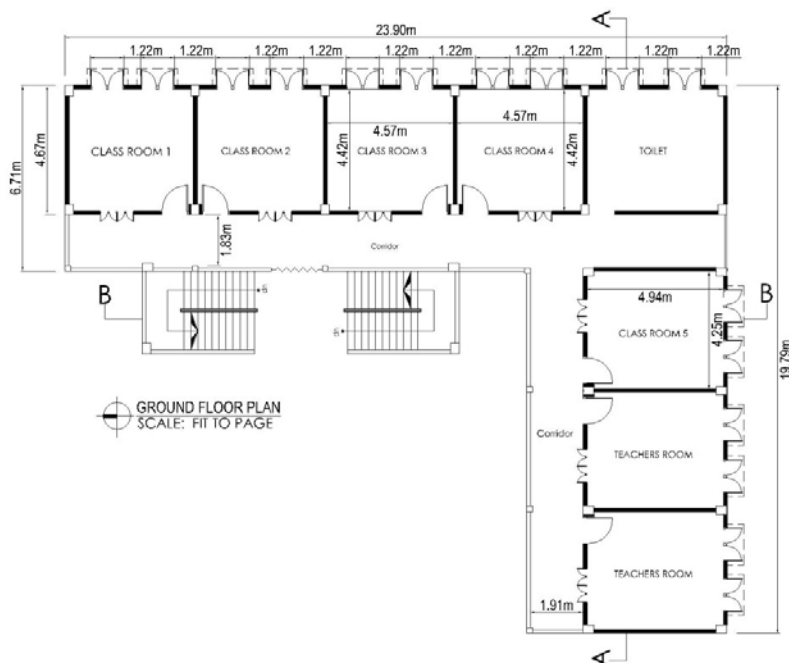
Ground and typical 1st floor plan of KHASDOBIR GOVERNMENT PRIMARY SCHOOL . (Source: author)
